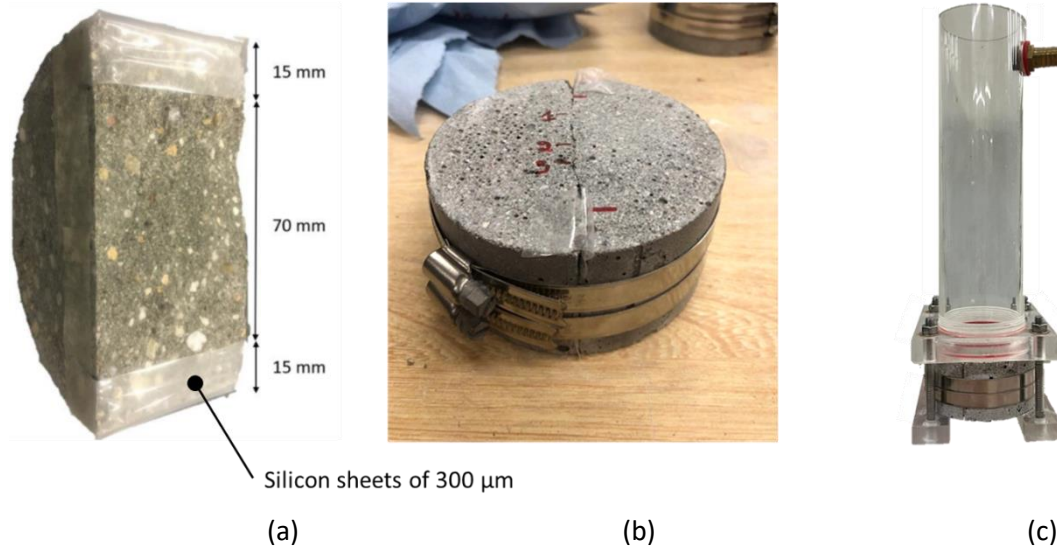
Overview of the preparation of the cylindrical specimens: (a) application of silicon sheets of 300 μm ; (b) reassembled specimen with hose clamps; (c) cylindrical water reservoir attached on top of specimen.
